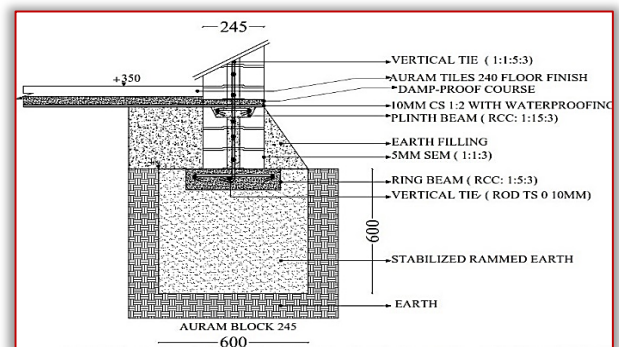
Compressed stabilized earth foundation and composite plinth beam
